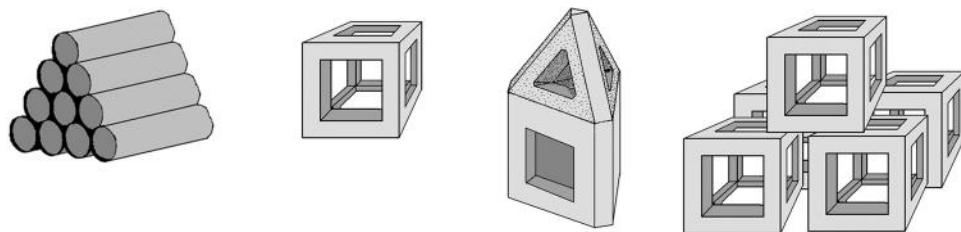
Turkey: Concrete modules used for artificial reef construction.
